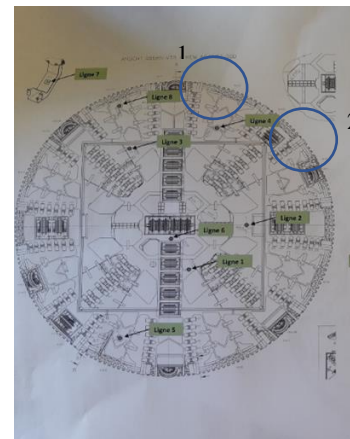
Identification of cutting teethes¹ and roller disc cutters² in Paris Metro TBM cutterhead
